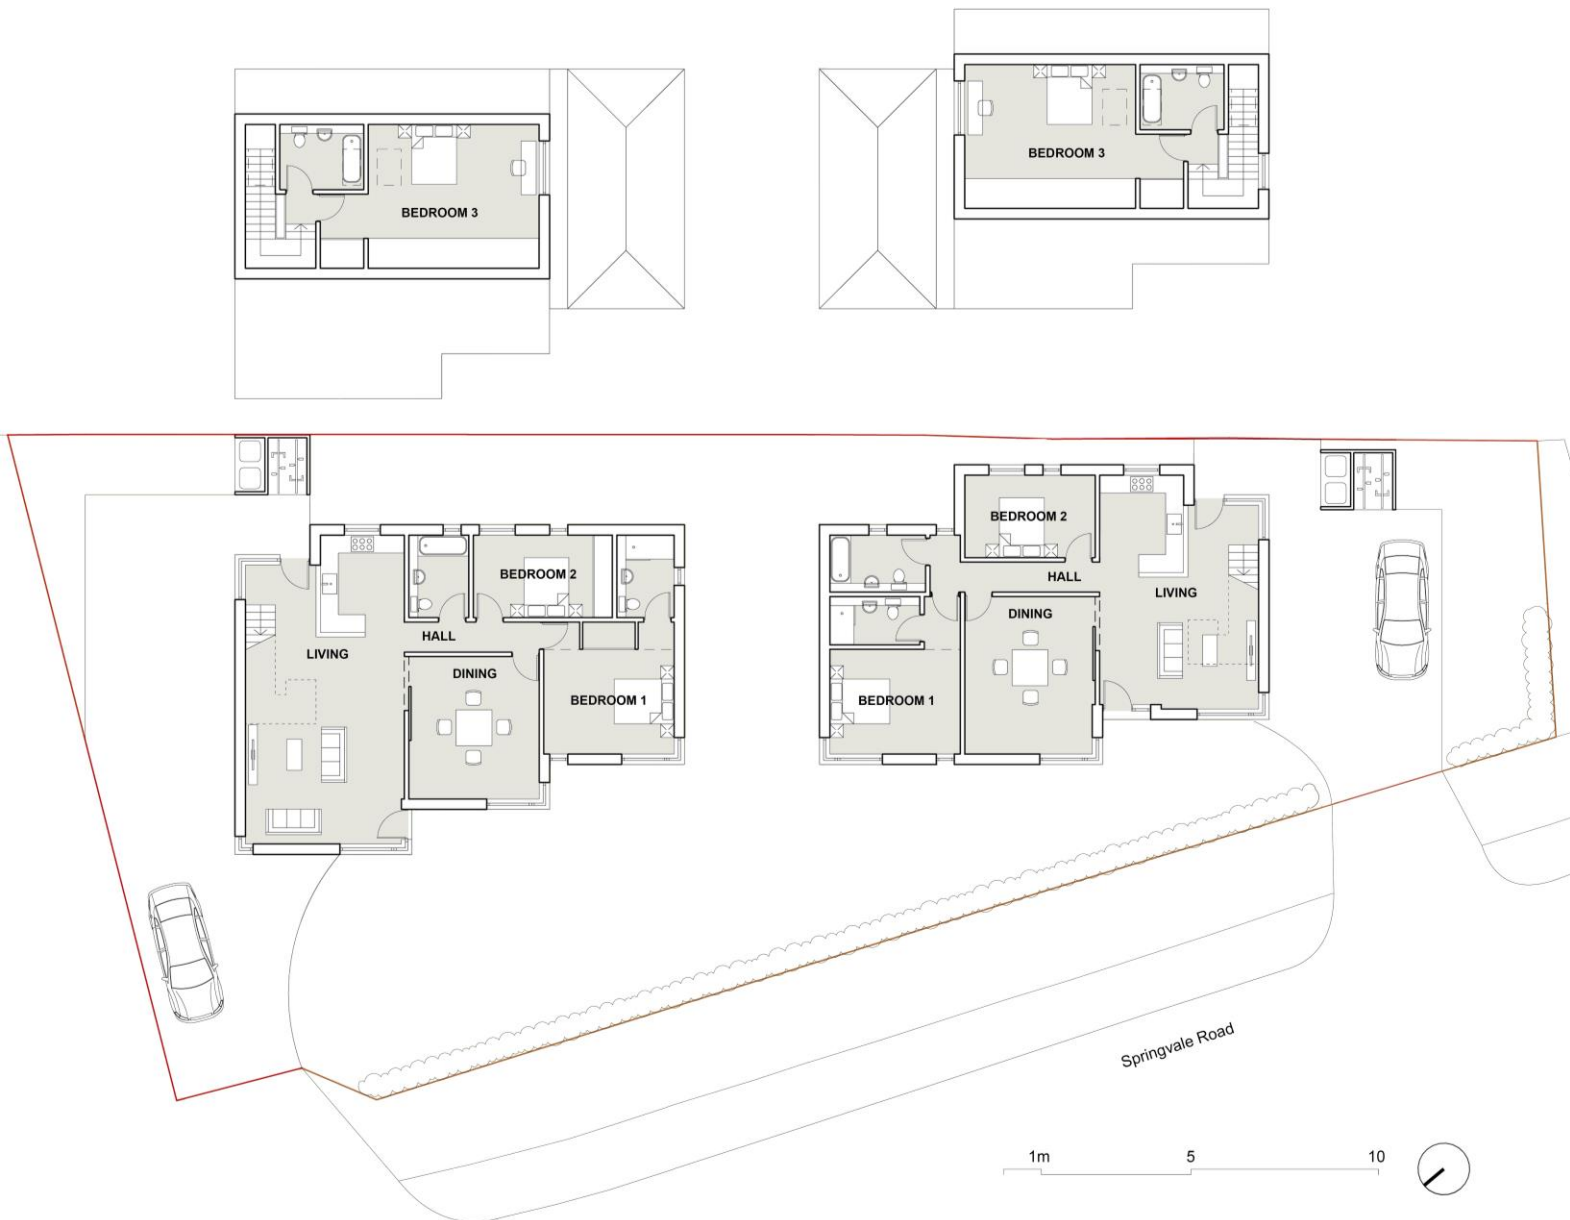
Two houses on Springvale Road, Author, 2019. Ground and first floor plans.
